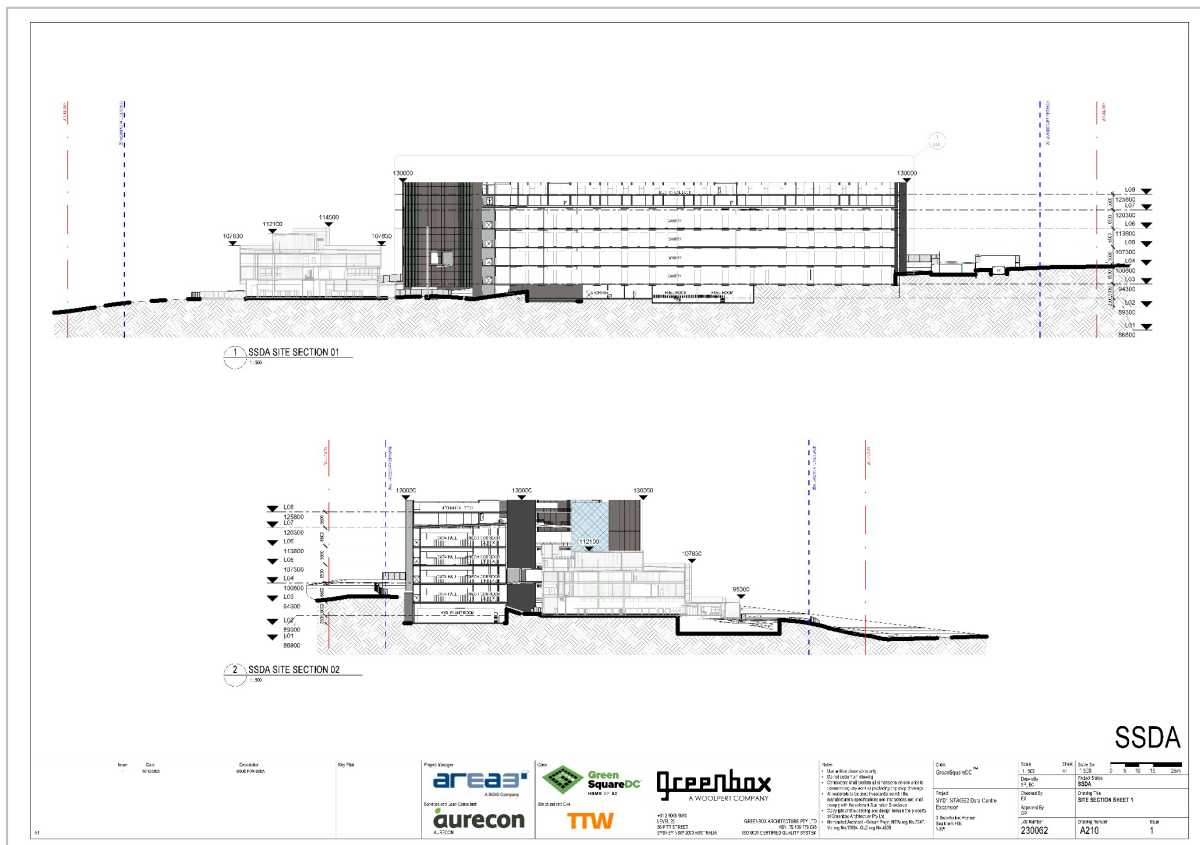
Site Sections (Source: Greenbox. 2025).
